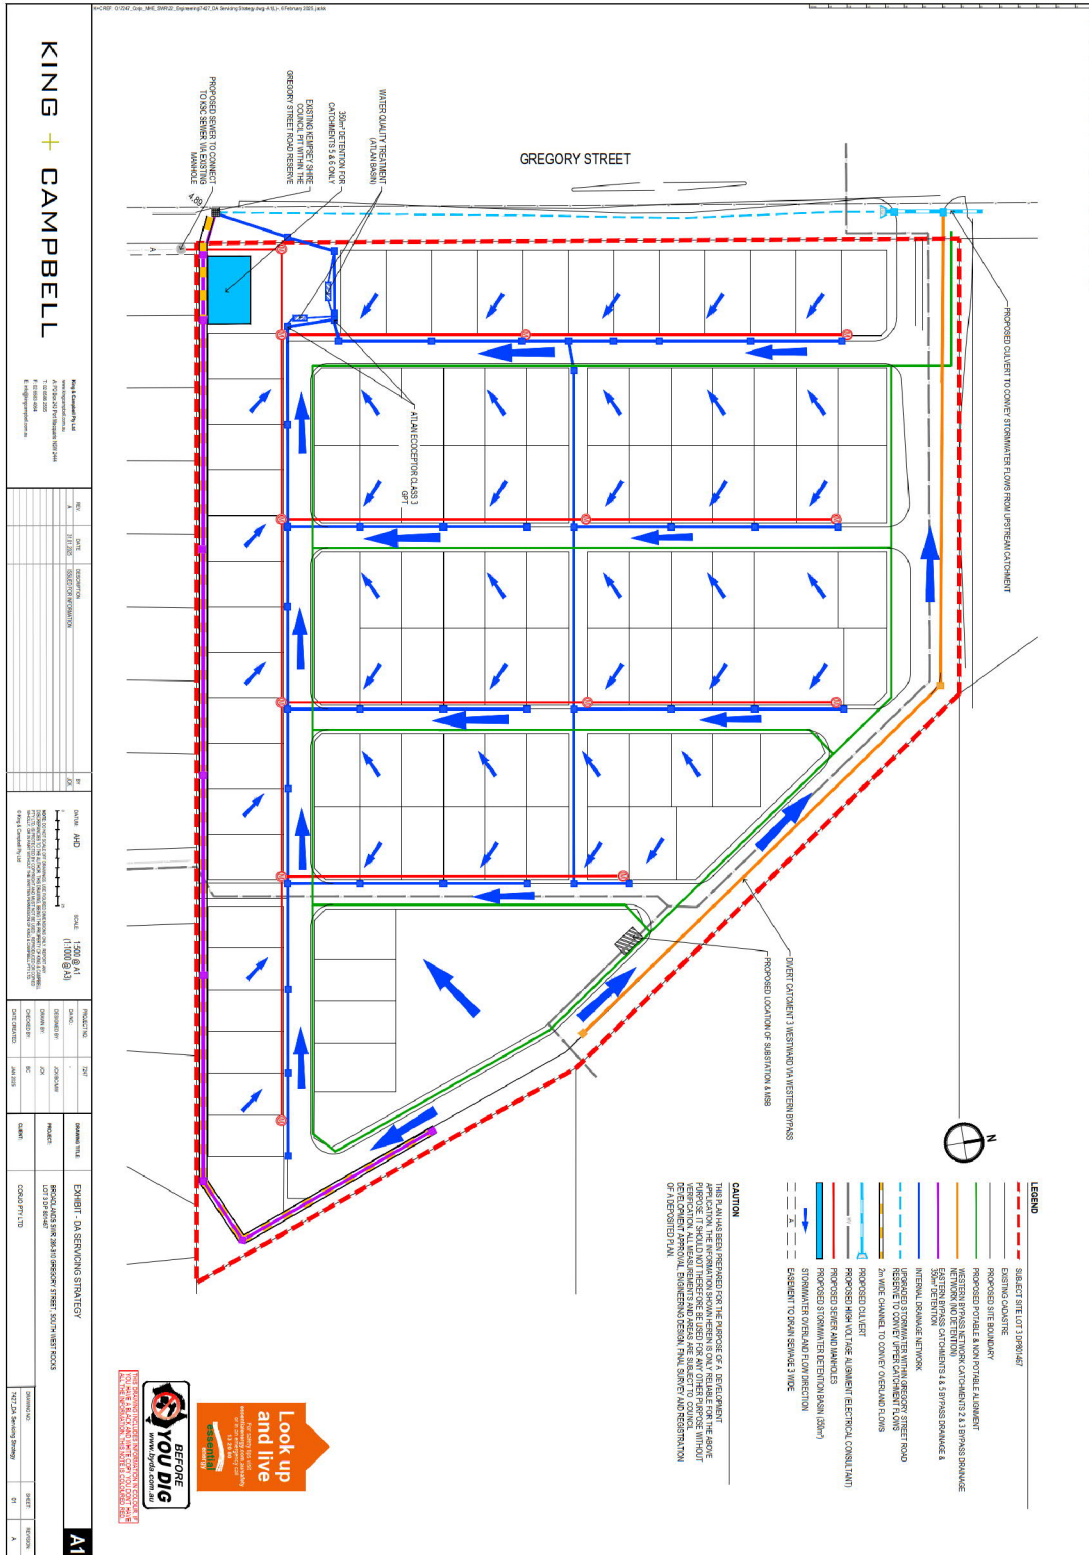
Extract Servicing Strategy Plan showing Stormwater Layout and Features
